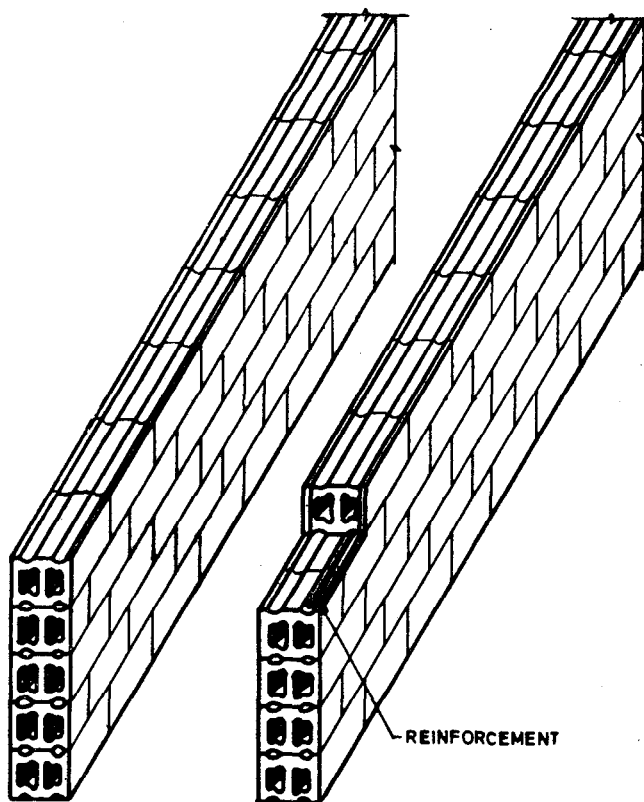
SLAB PANELS BUILT LIKE A WALL USING CLAP BLOCK
